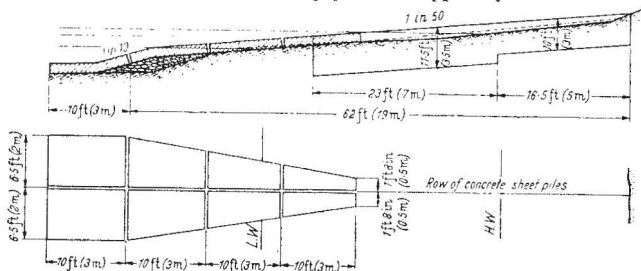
Groyne (new type) using concrete sheet piles as connection to shore
